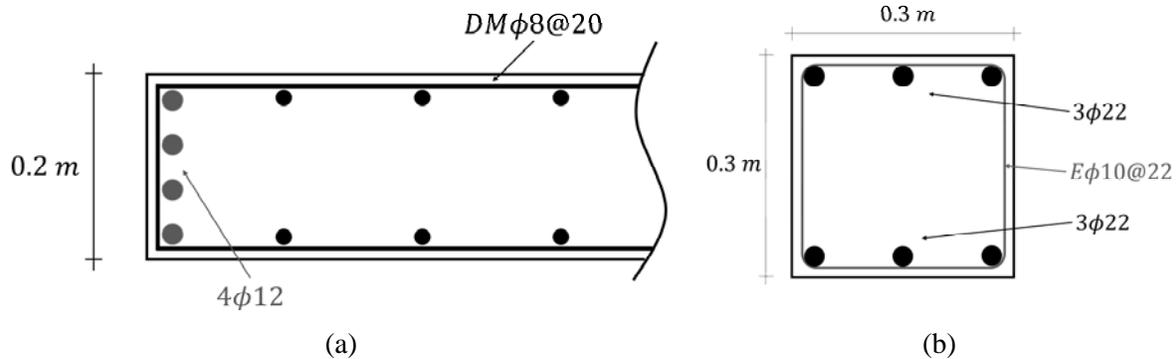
Structural elements cross-sections: (a) RC wall, (b) Coupling beam
